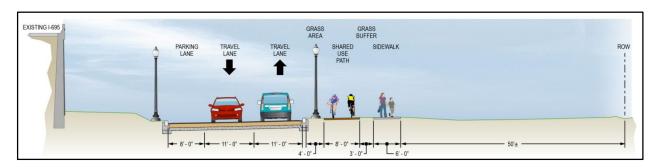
E Proposed Typical Section between 8th and 9th Streets
